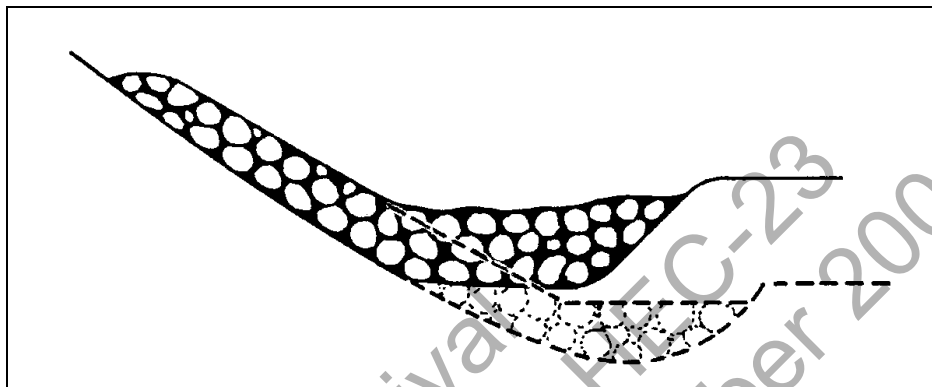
Rock-fill trench (after HDS 6).⁽⁸⁾
